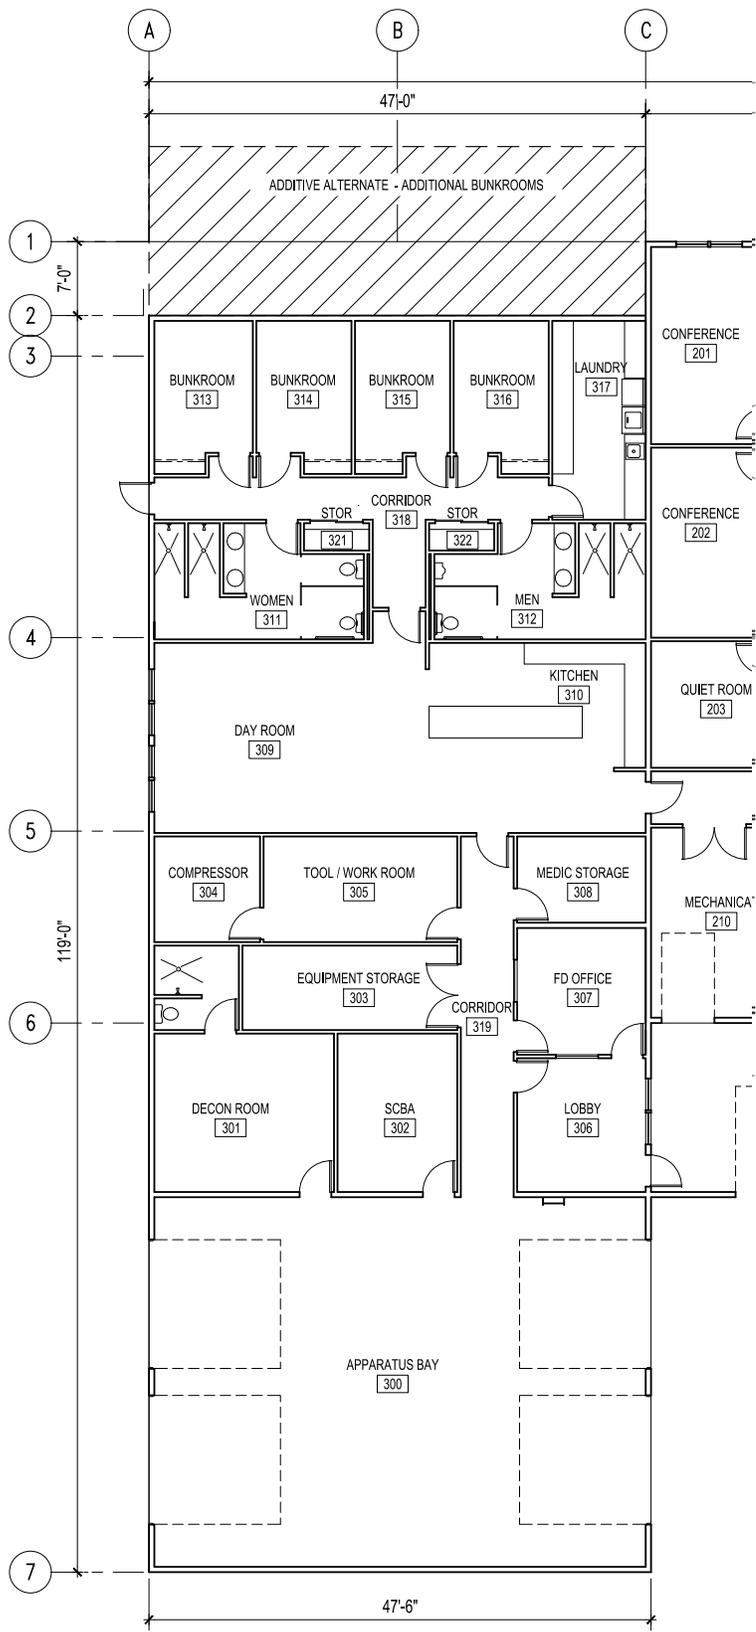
Preferred Building Concept: Fire Department Floor Plan
